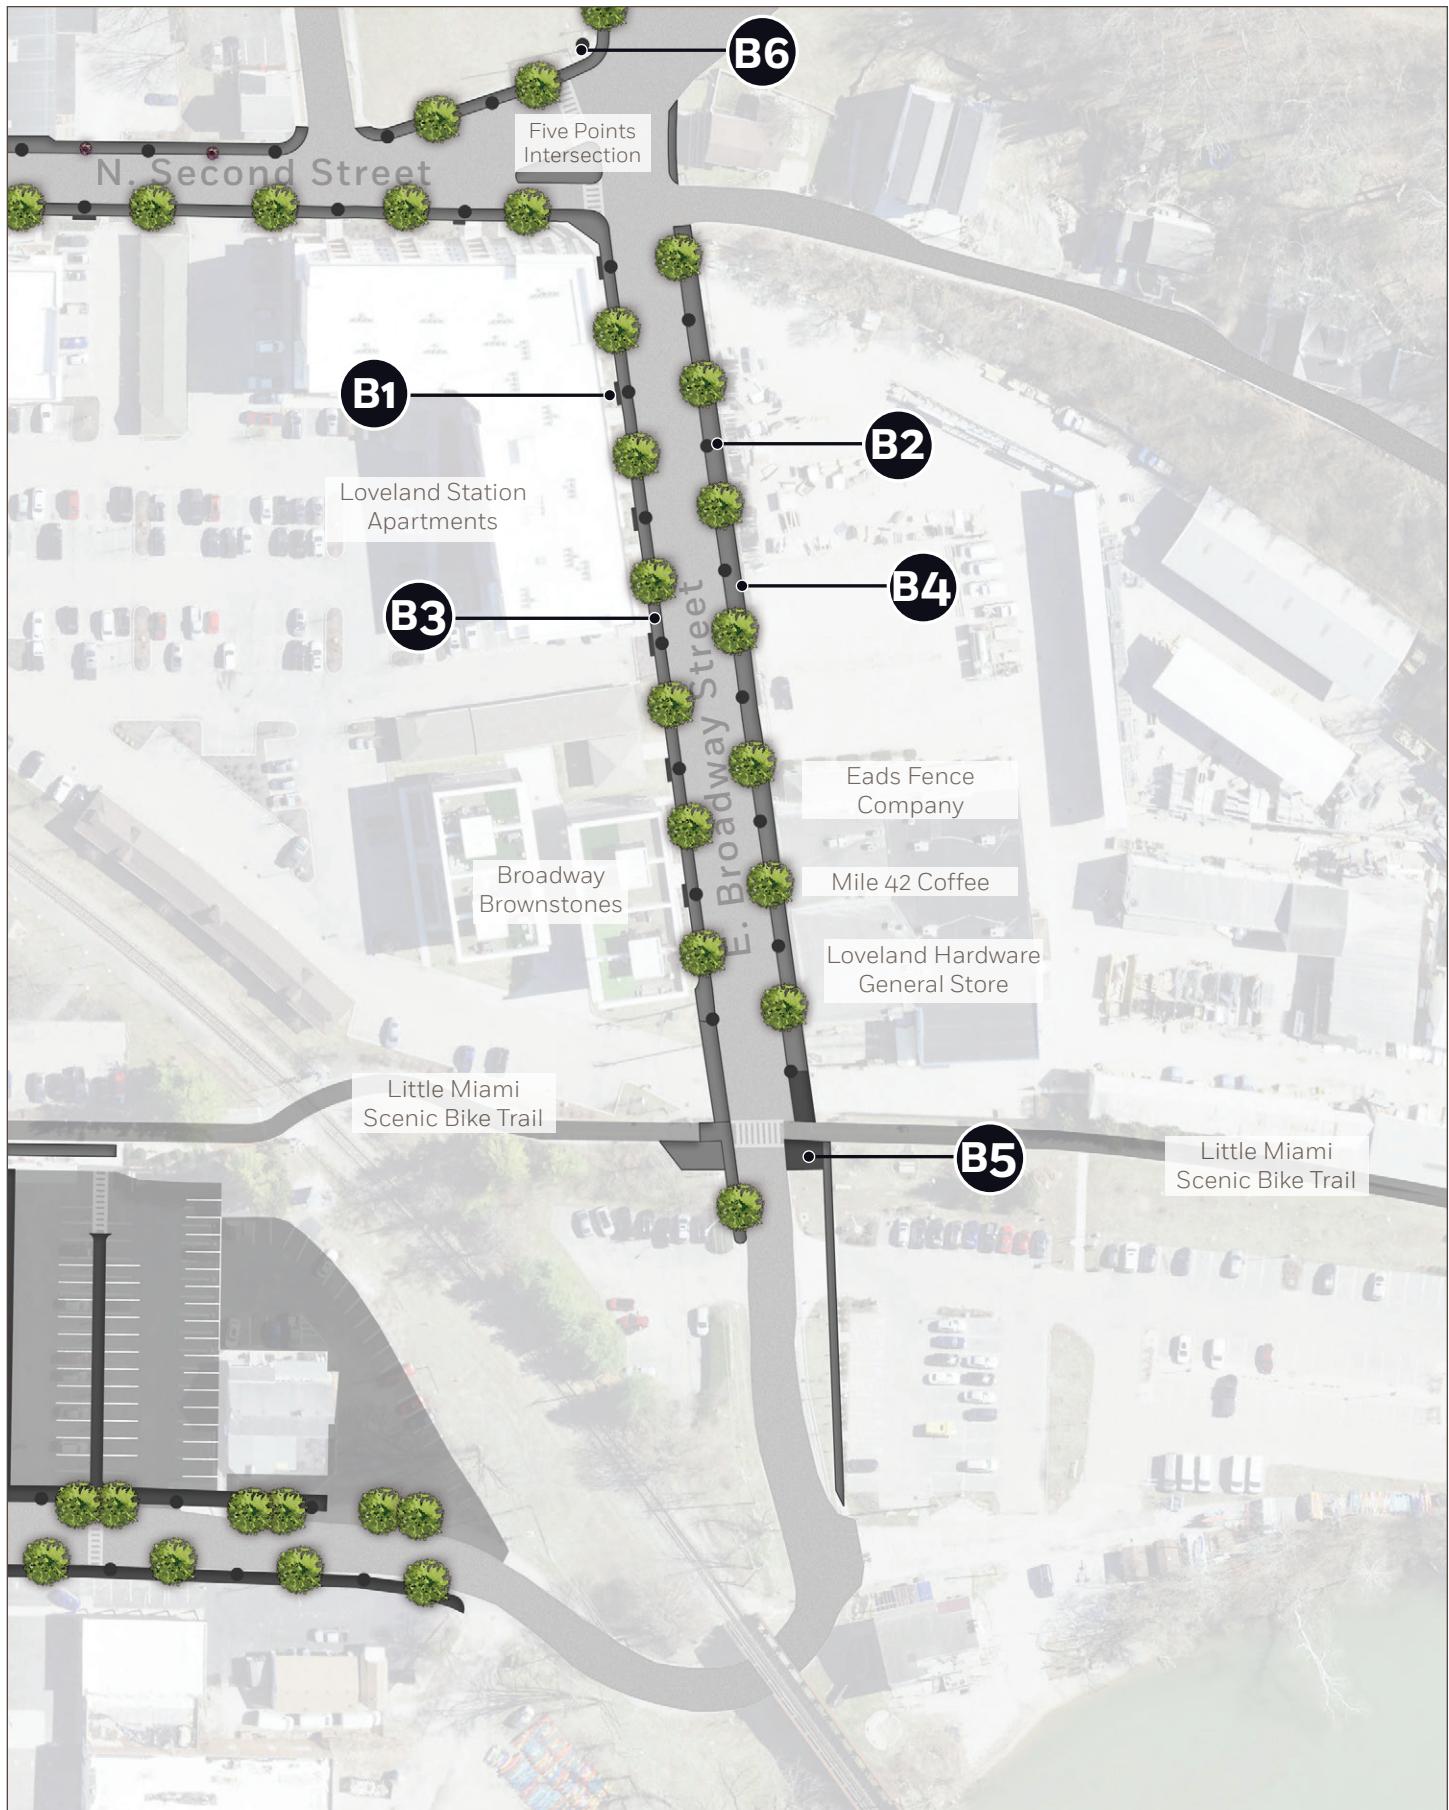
A conceptual plan for the entire E. Broadway Street Corridor.
